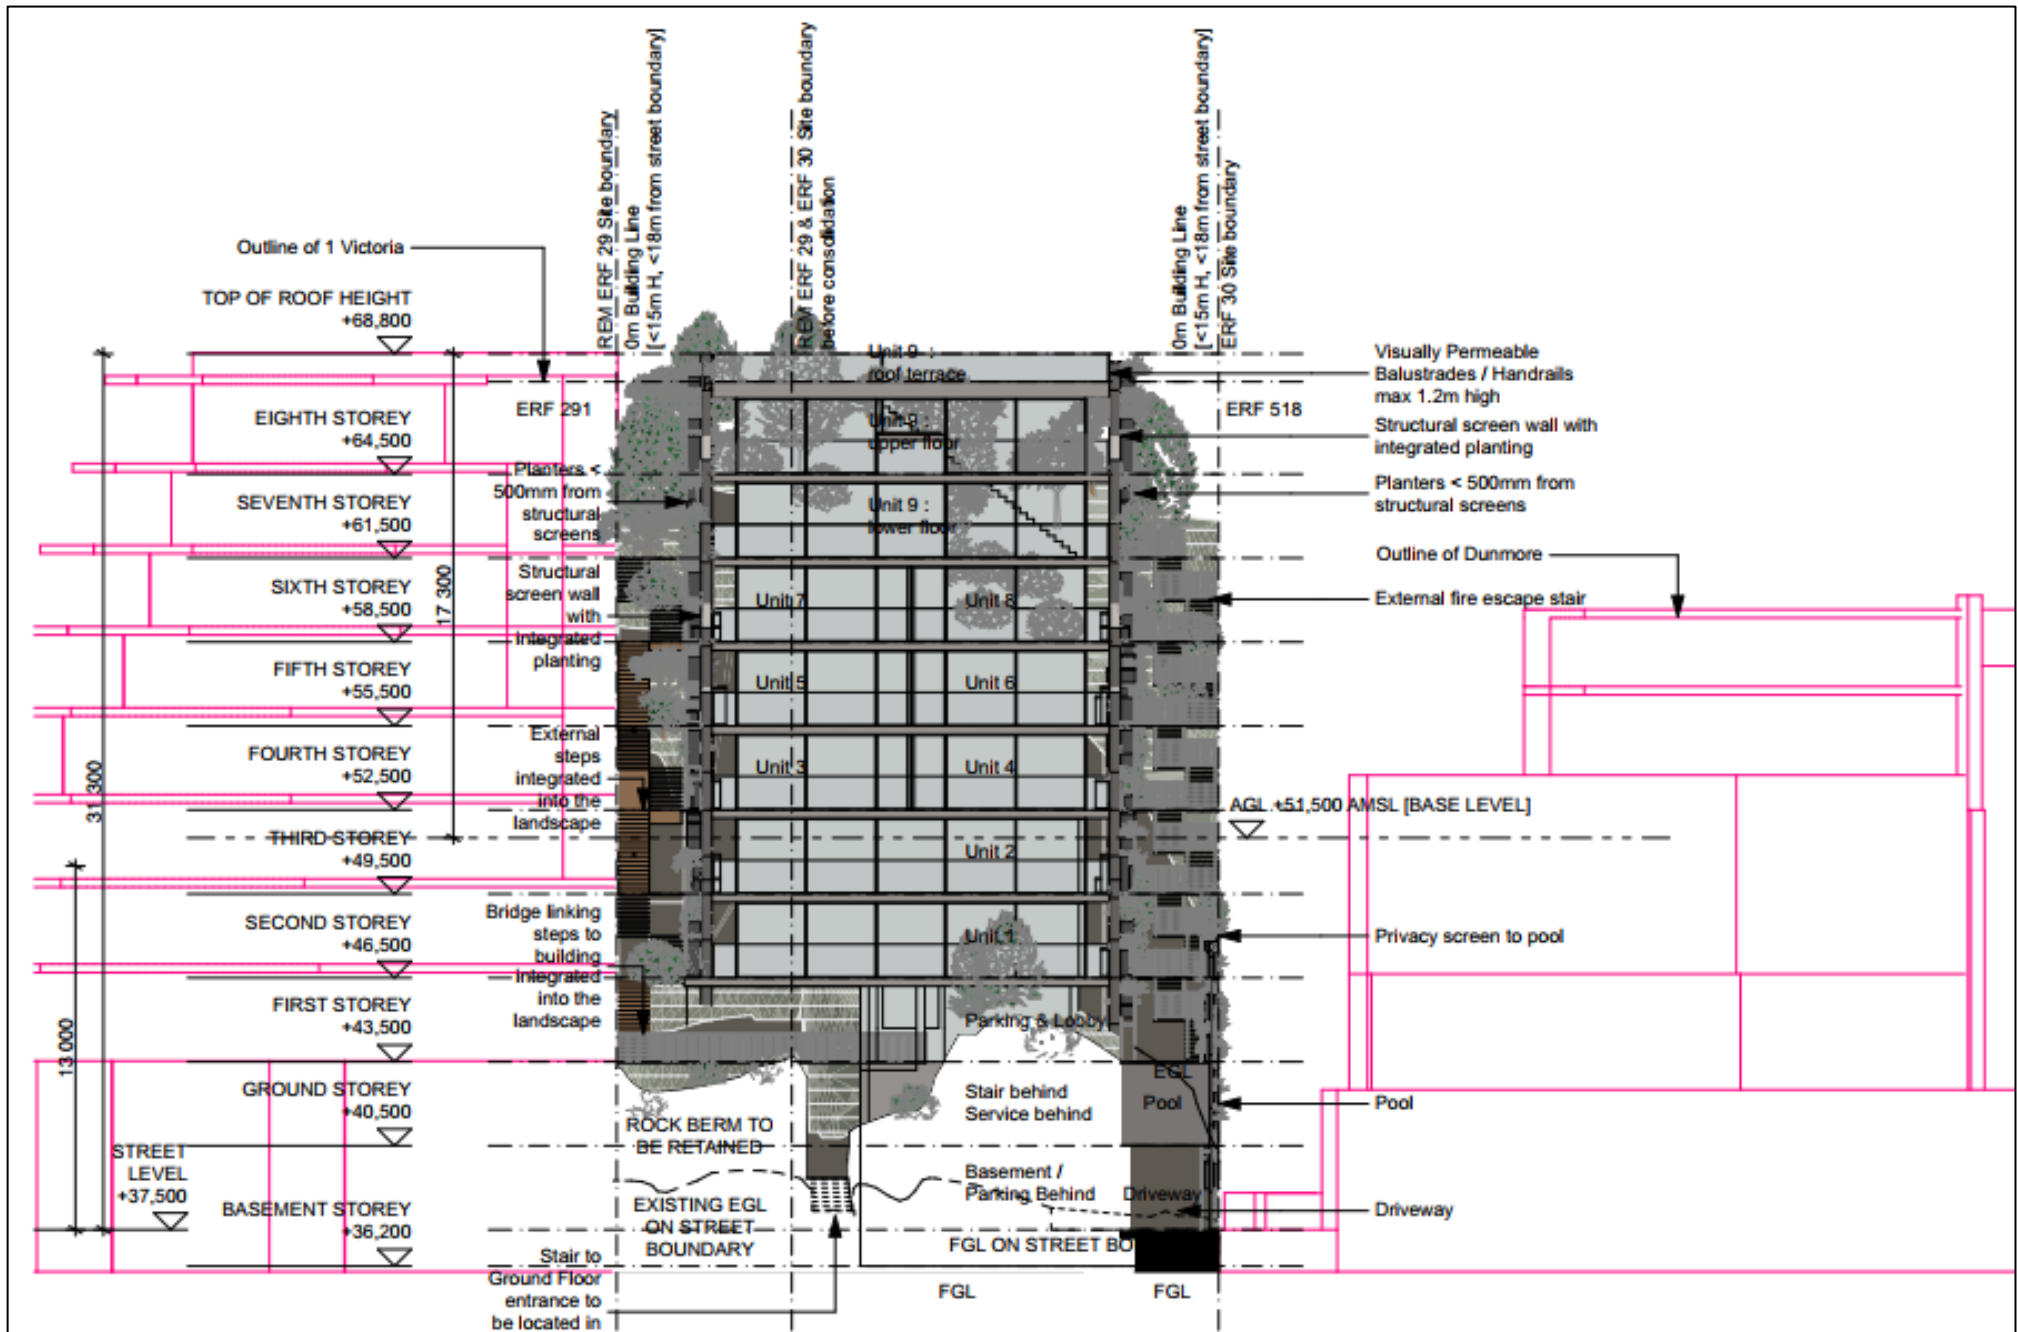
South West (Street) Elevation (source: designworkshop, August 2020)
